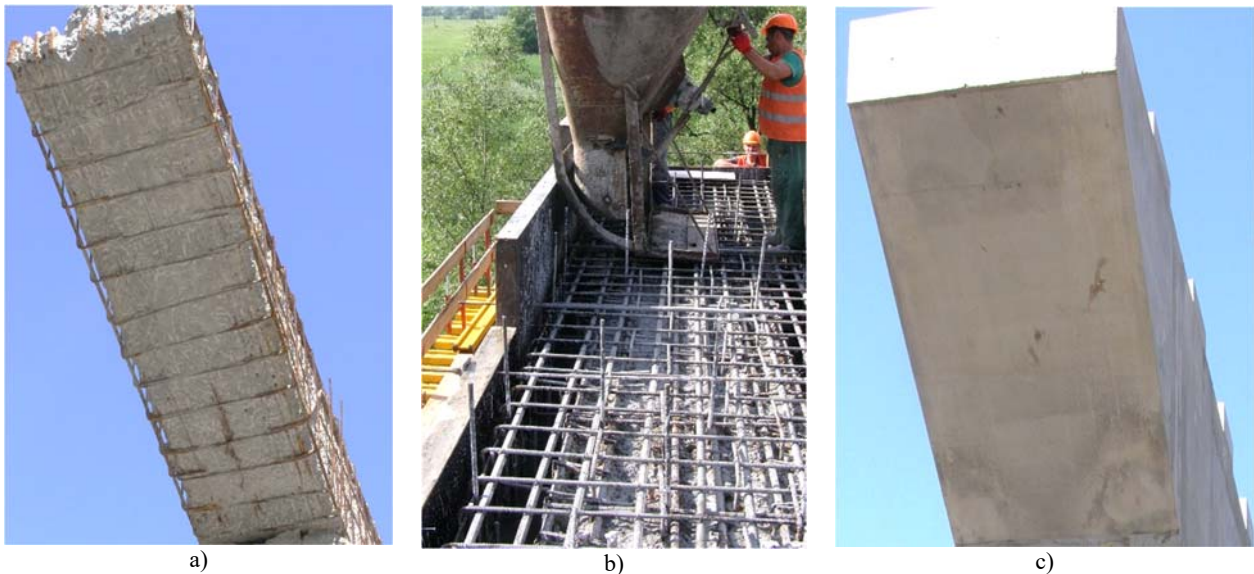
An example of the reinforcement of the crossbar reinforcement bracket: a – cleaning of the defective crossbar from the remains of concrete up to the working reinforcement; b – working reinforcement and bracket formwork covering by Sika MonoTop-910 N; c – finished reinforced concrete bracket.
